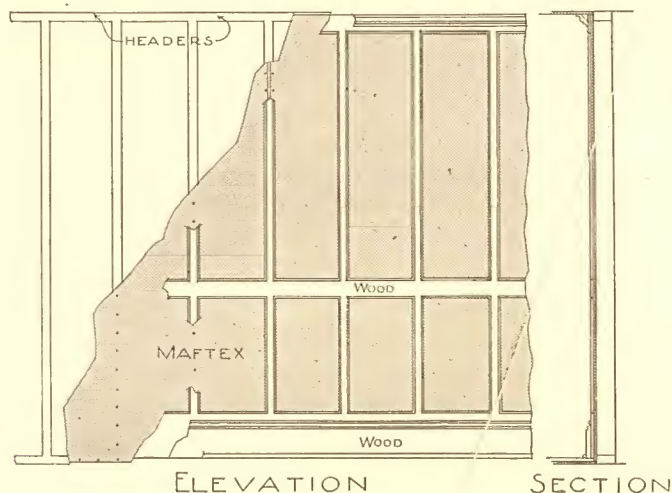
MAFTEX and wood battens applied in a somewhat similar manner to Fig. 5, thus insuring full insulation, but with the addition of a wider horizontal batten at chair rail height. The ceiling would have similar battens at joints.
